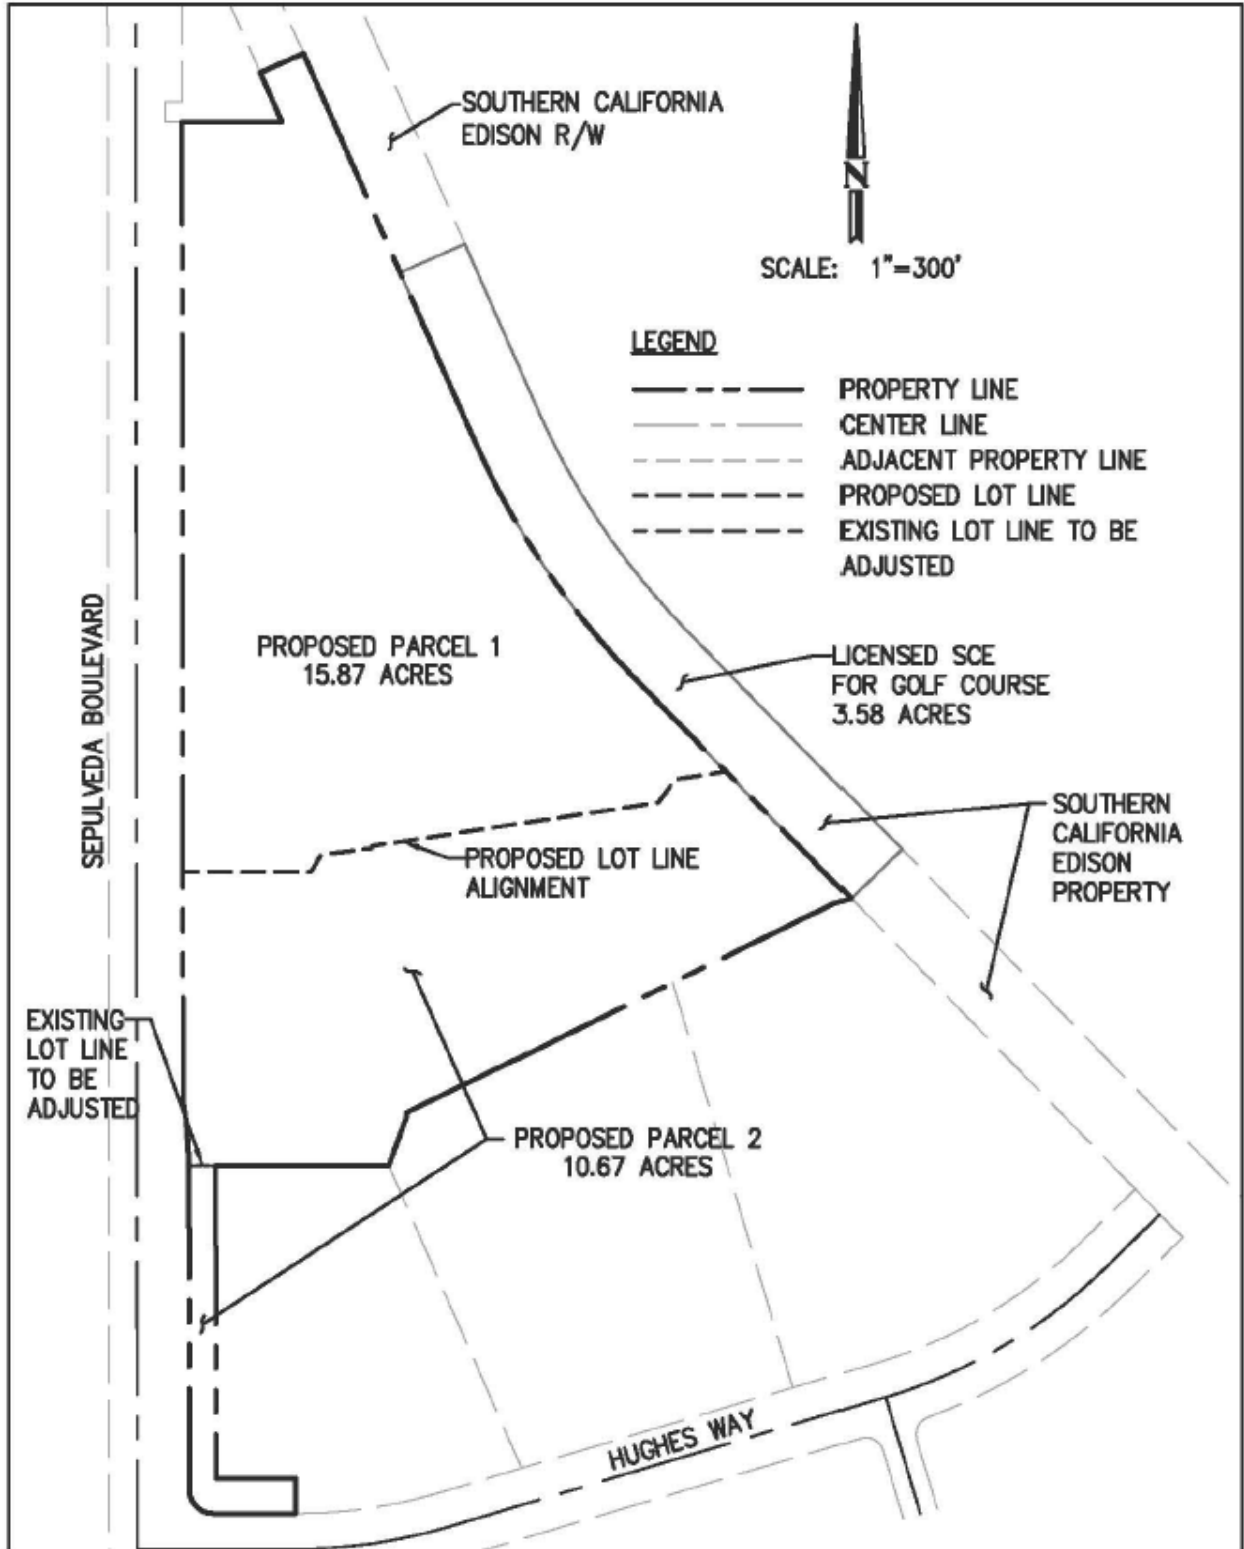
A CONCEPTUAL SITE PLAN – PUBLIC RECREATION/OPEN SPACE SUBAREA
